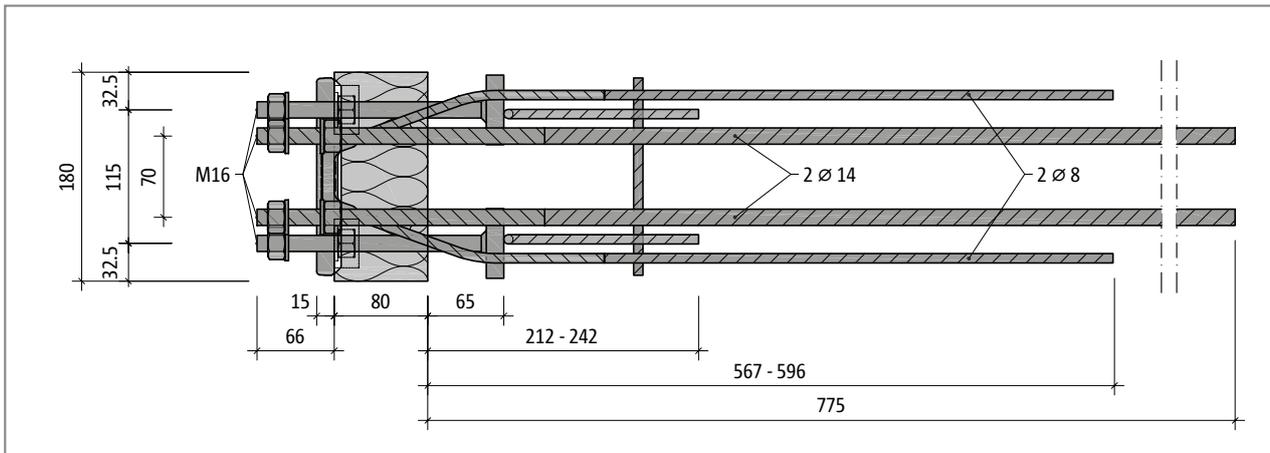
Schöck Isokorb® T type SK-M1-V1: Plan view
